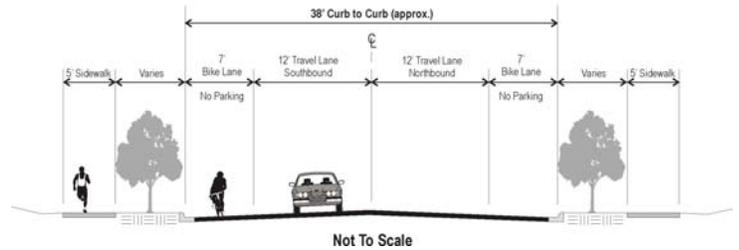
Typical Section-Baker Avenue (10th Street to 13th Street)
